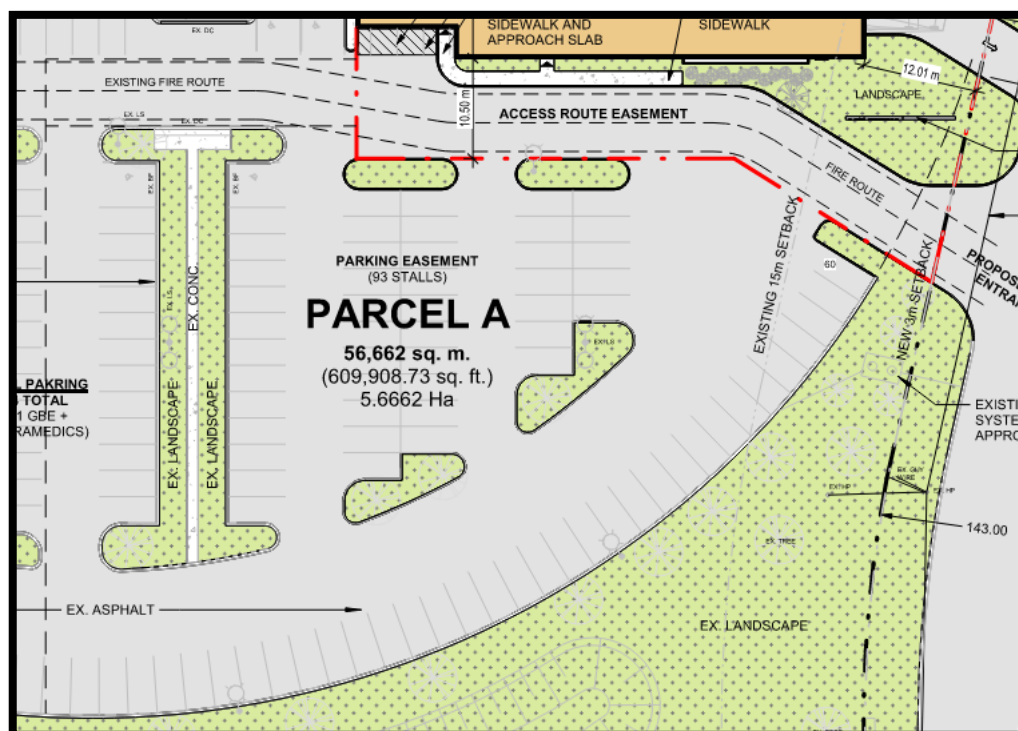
shows the proposed parking arrangement; the applicant proposes a parking easement on the retained lot, in favour of the severed lot, accommodating the 93 required parking spaces, and an access easement on the severed lot, in favour of the retained lot, to allow for access to the parking spaces associated with the existing Grand Bridge Energy office.
